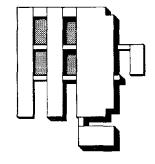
Preliminary alternative schematic designs studied by the architects.
